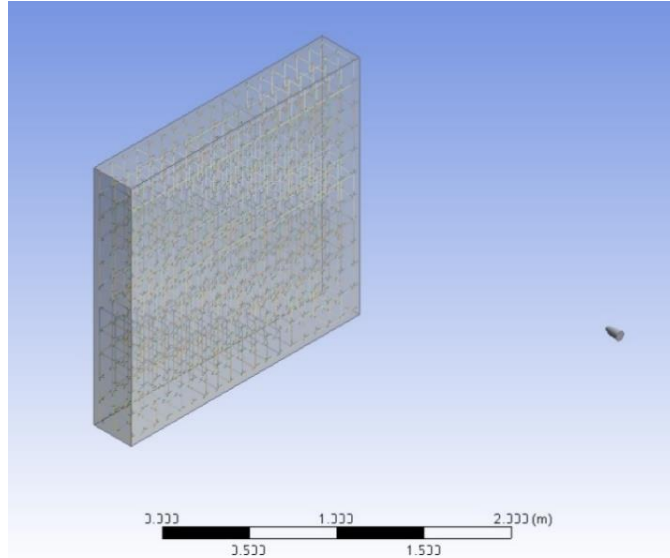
Reinforced Concrete Wall with Fragment due to 15.35 kg TNT Shaped Charge.
